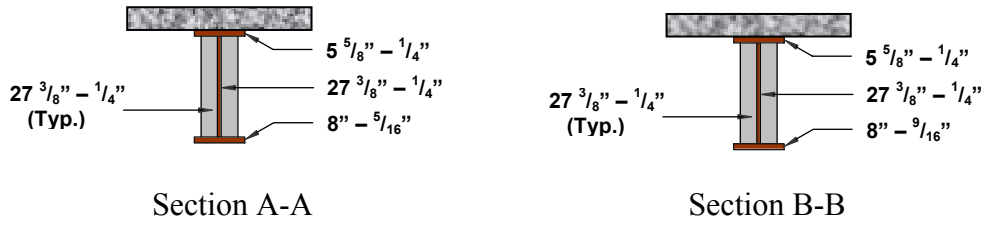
Cross section of girder profiles for the AISI-FHWA bridge
